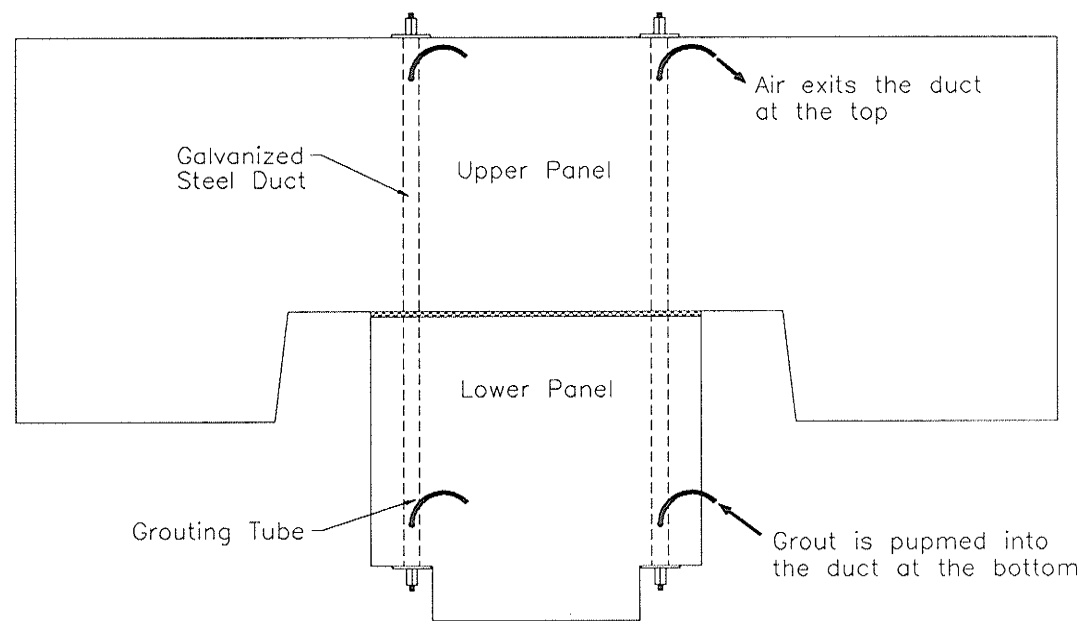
Grouting Procedure for Post-tensioning Ducts
